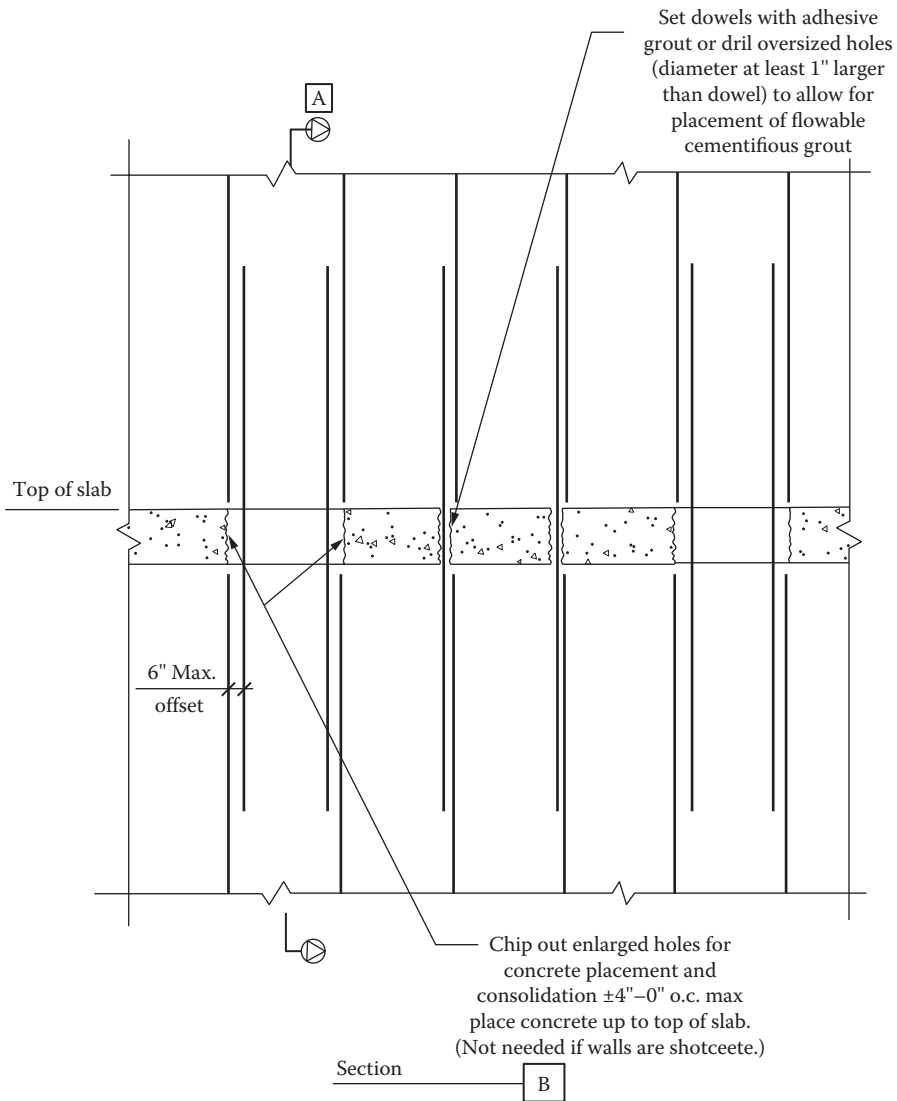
Concrete wall connection to concrete slab—partial elevation view.
